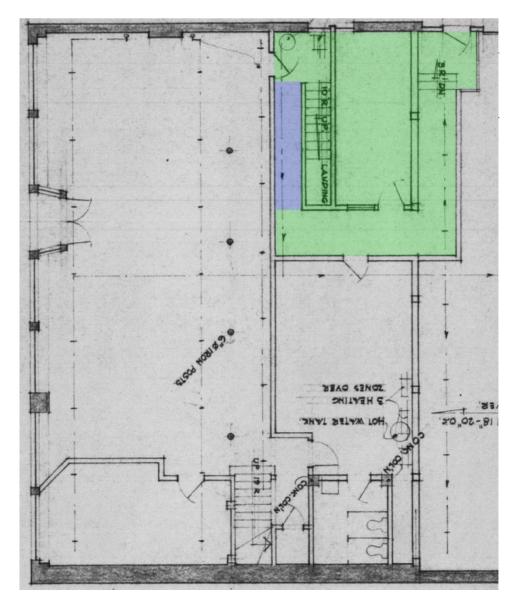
Detail of a 1977 architectural plan, showing the remnant corridor (blue) as part of the larger packing area (green).⁶⁸
